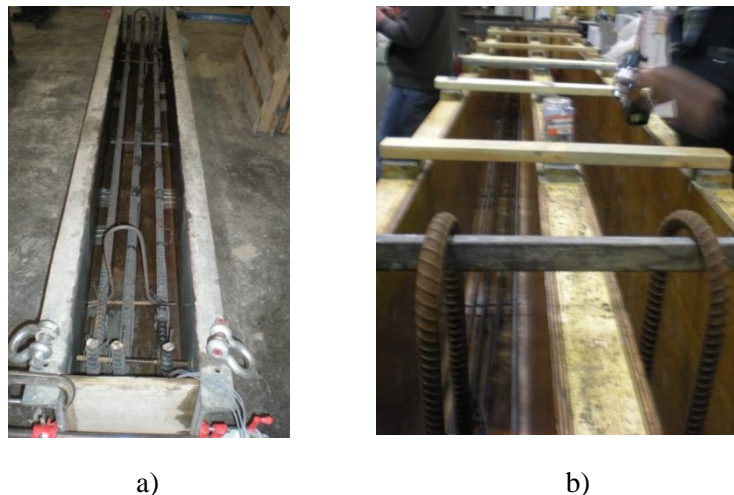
Formwork and Reinforcement Layout for a) $h = 300$ mm and b) $h = 1000$ mm Specimens
